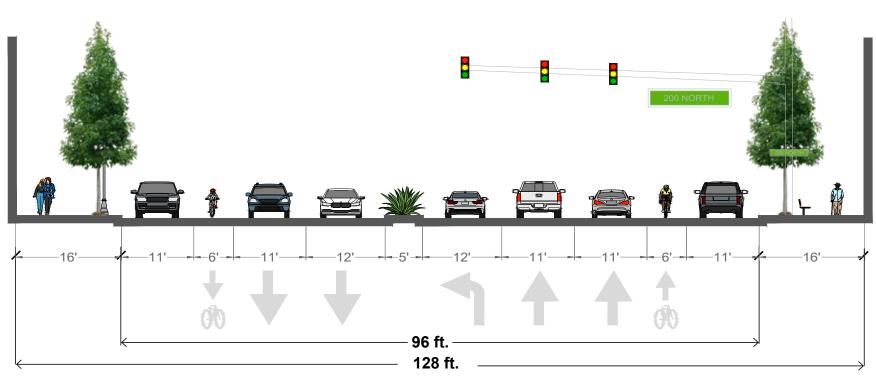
The Vision Plan proposes to delineate on-street parking, add bike lanes, and add landscape and hardscape elements to enhance Main Street.
